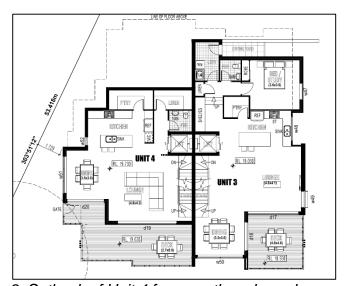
Setback of Unit 4 from southern boundary - midfloor
